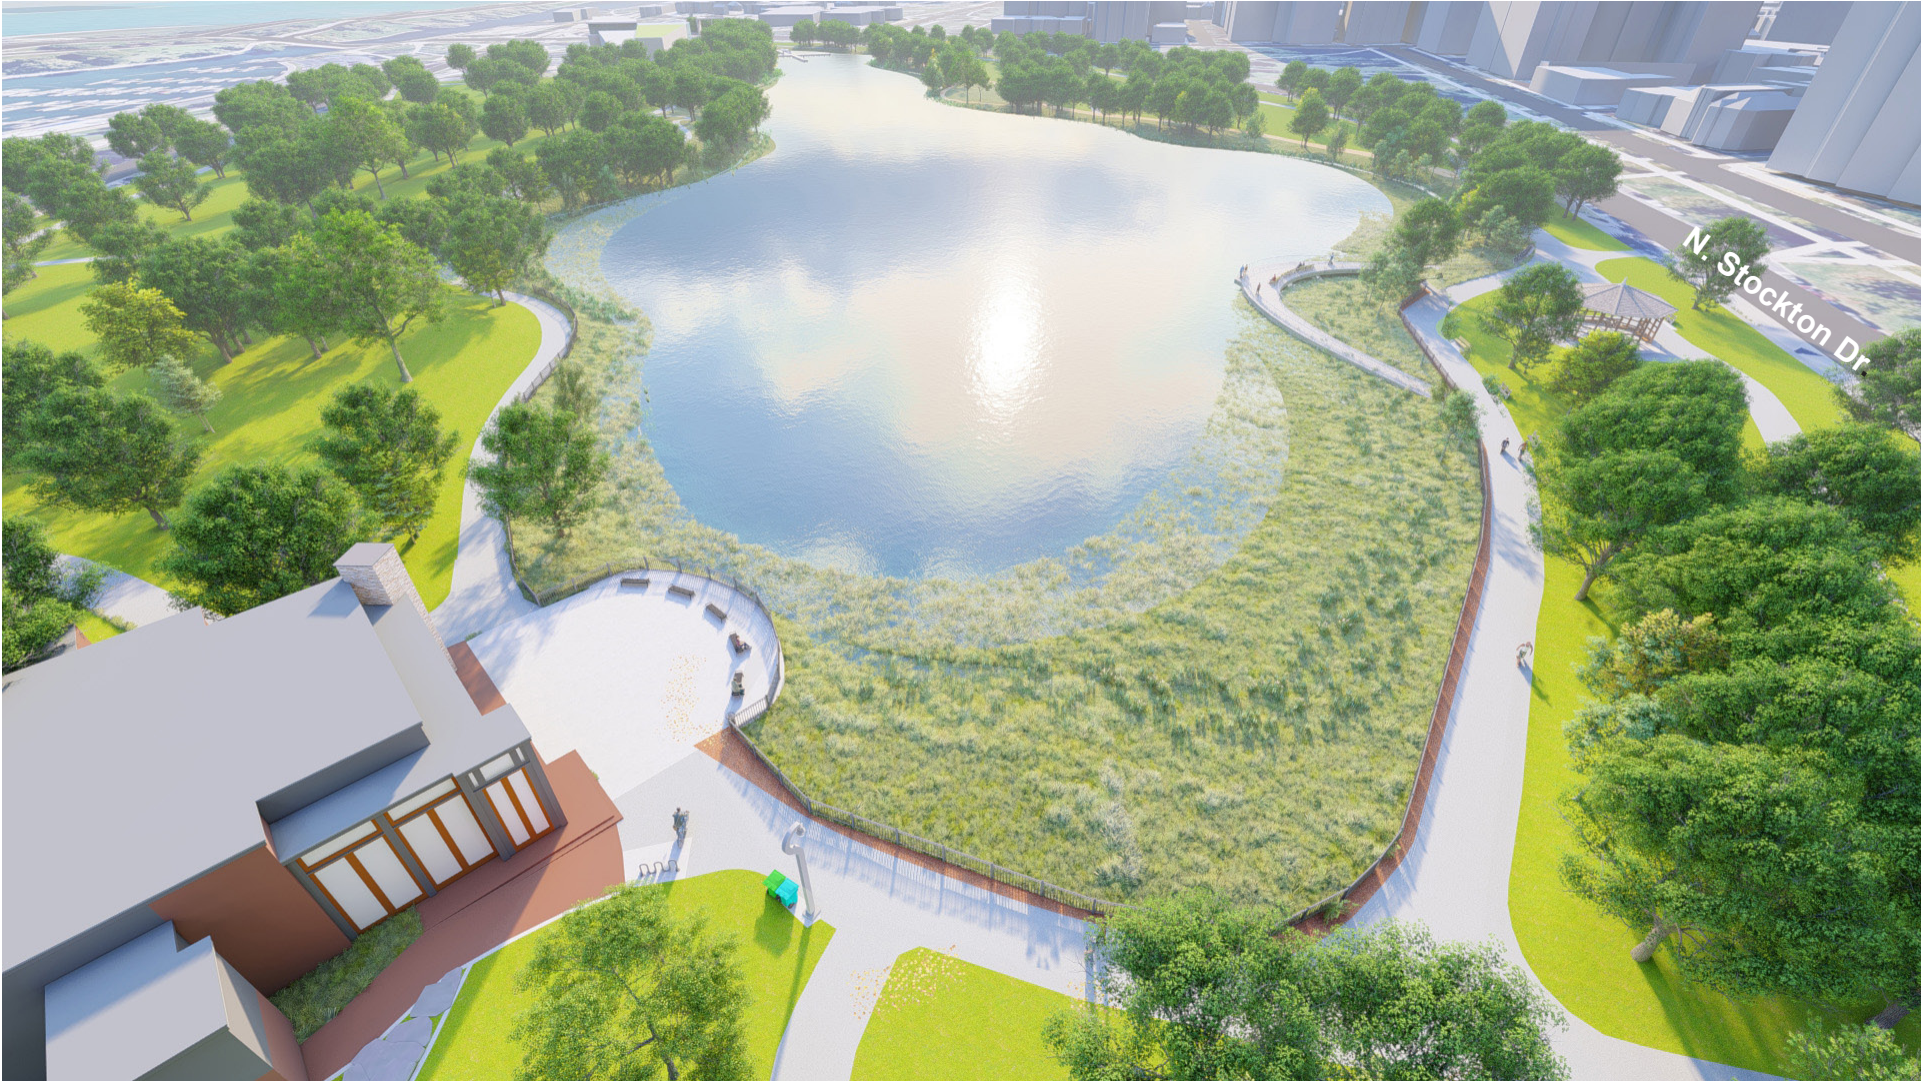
Site Rendering - Proposed New North Boardwalk
